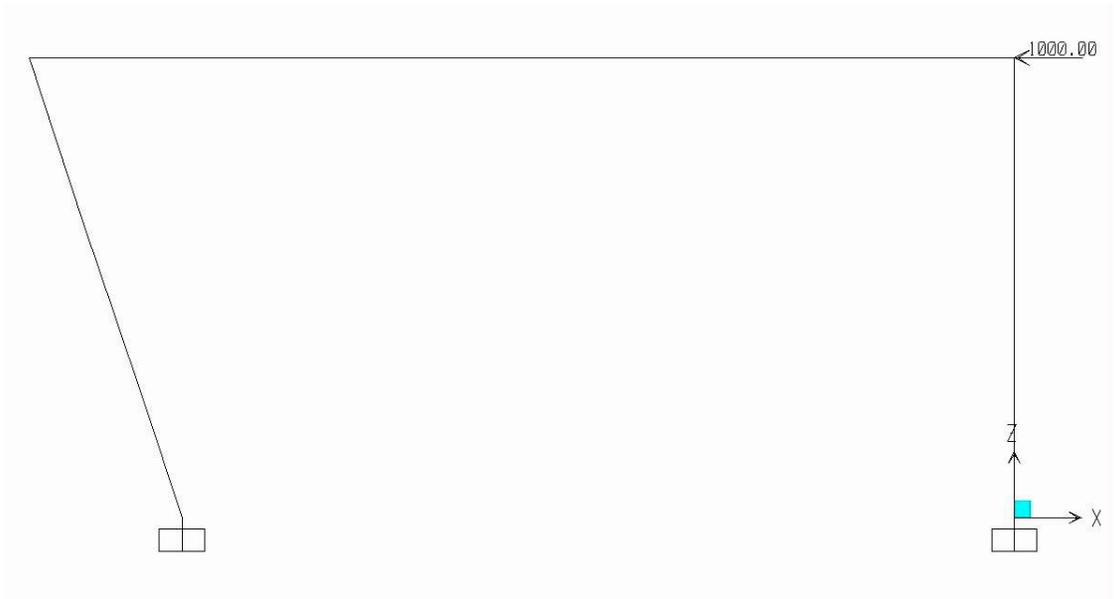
Pier 3 Transverse Loading Lateral 2
